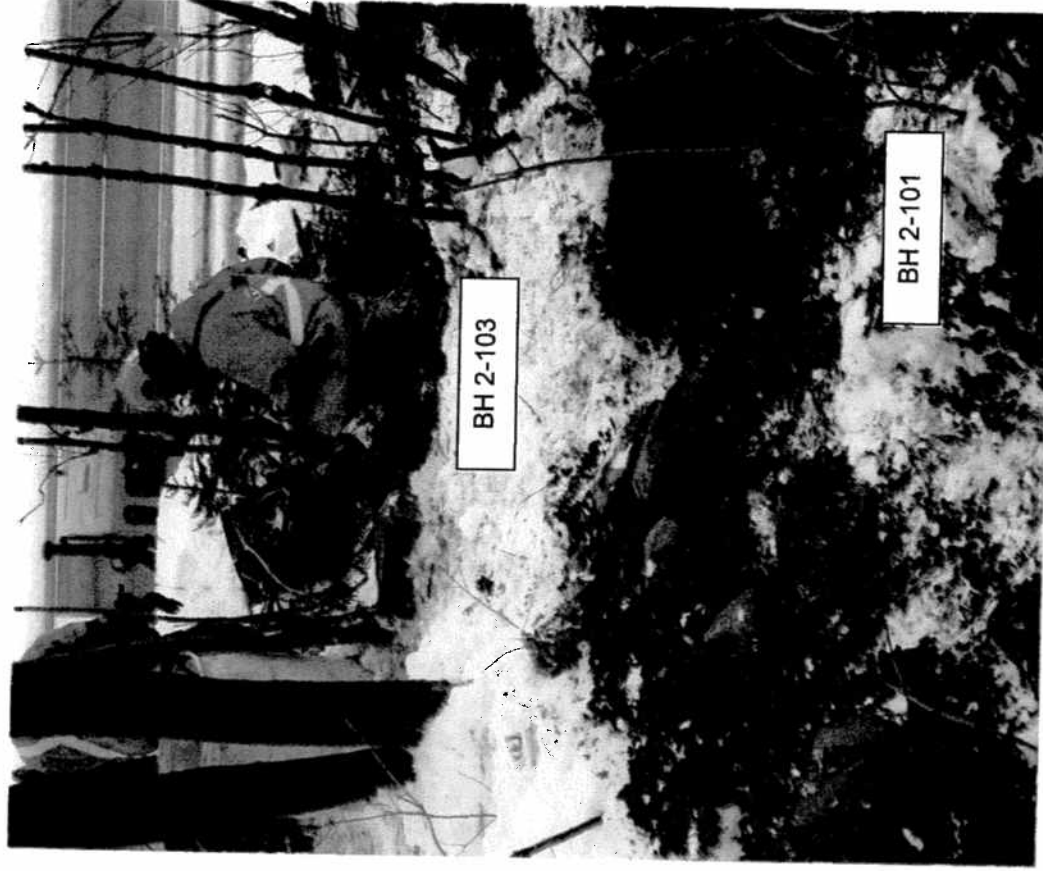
Stephenson Road # 2, East abutment WP stake – Centre pier and West abutment visible. (October 25/04)
